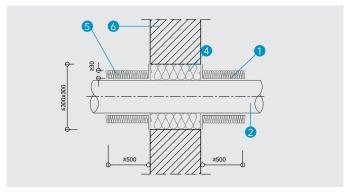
Detail A - Penetrations of steel or cast iron pipes diameter exceeding 42 mm through rigid walls
